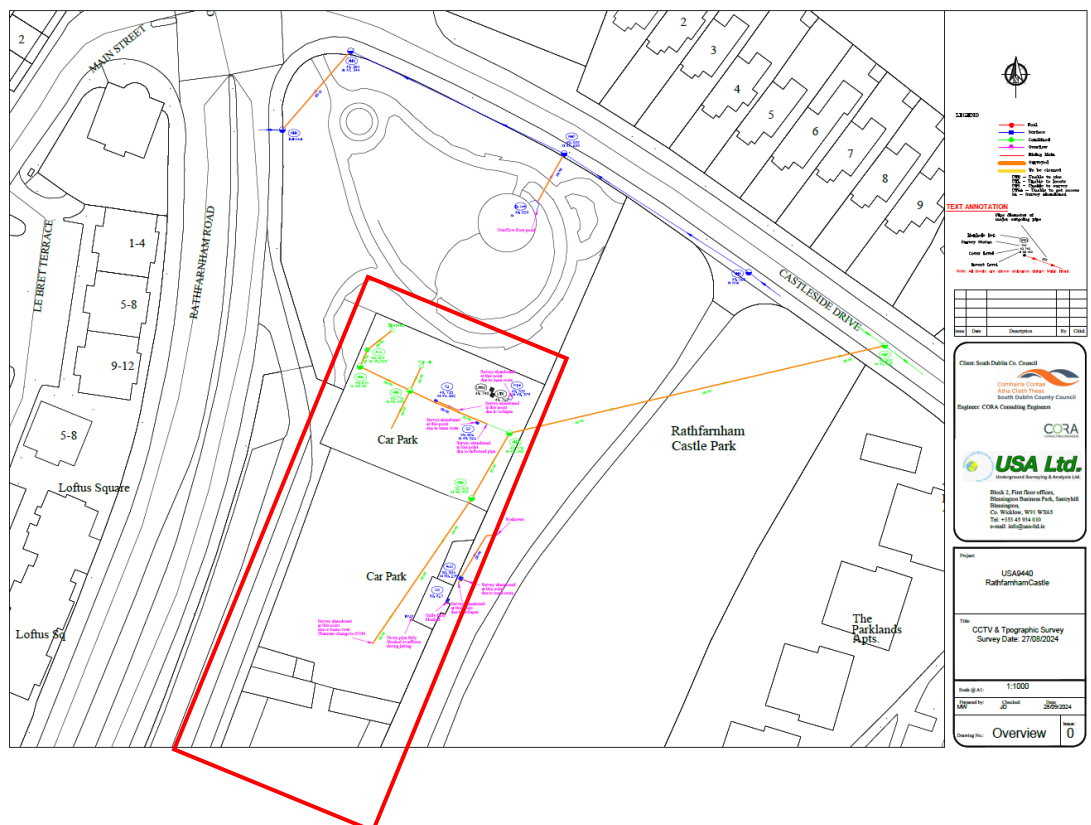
Extract from CCTV survey showing existing Foul drainage (orange line) 225mm uPVC routing to public sewer in Castleside Drive and storm sewer to north side of public
